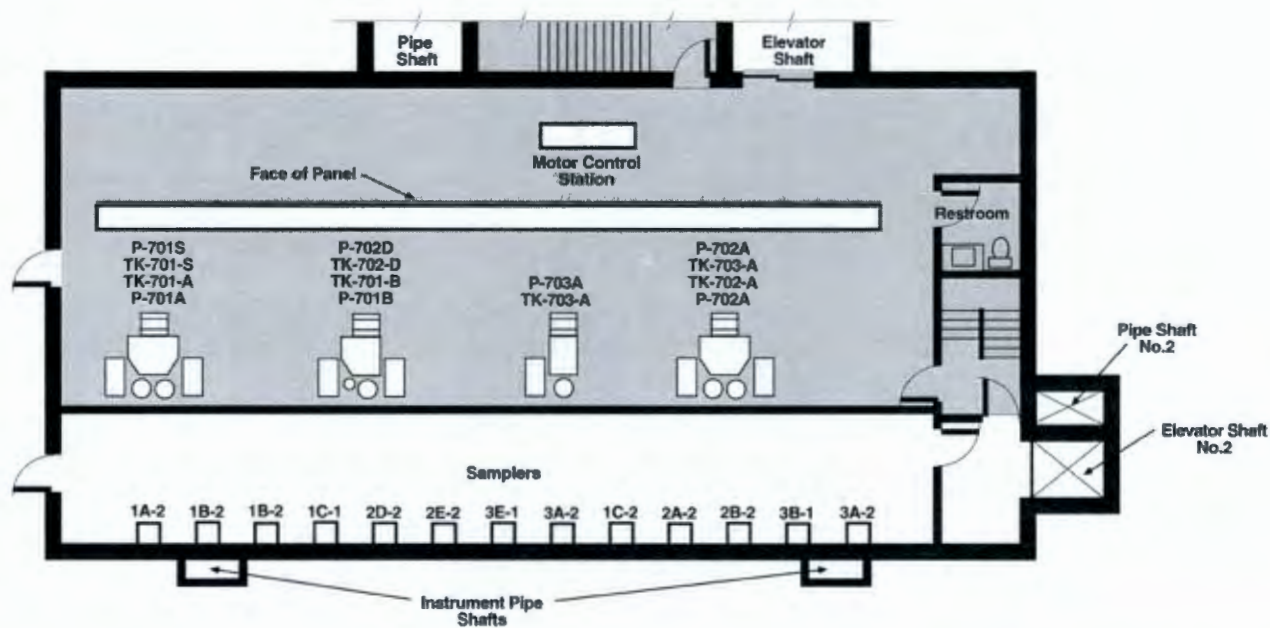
Silo Crane Level, Sixth Level, Plan View
